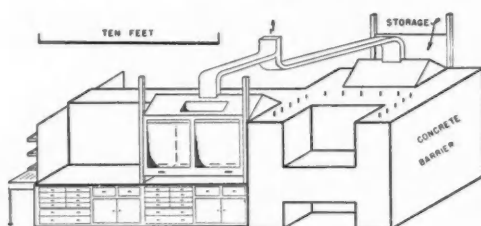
The concrete barrier as seen in isometry from the northwest; see text for details. The sketch is to scale except for ducts and hood details.
